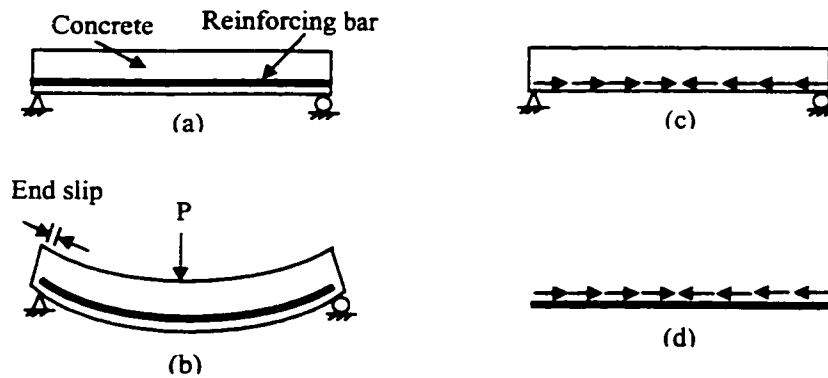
Bond stress due to flexure (a) beam before loading (b) unrestrained slip between concrete and reinforcement (c) bond forces acting on concrete (d) bond forces acting on reinforcement (Source: Nilson, 1991)
